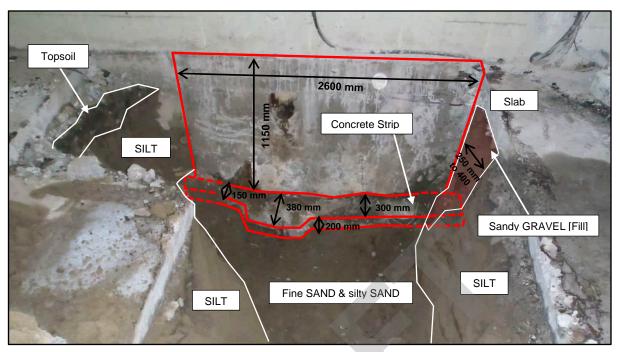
Strip Footing D7 ground profile facing south-west. All measurements are approximate.
